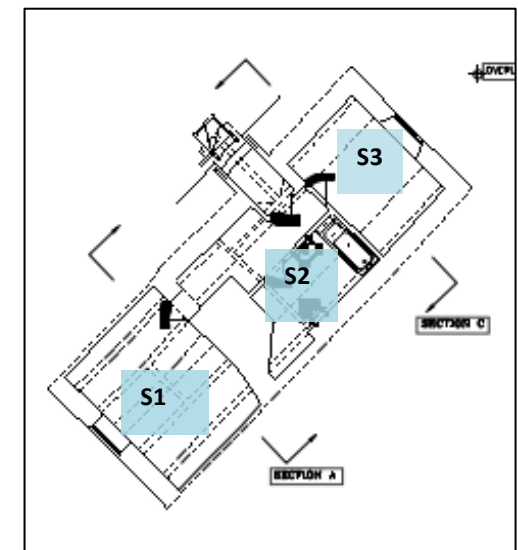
Second floor/attic plan with room codes, taken from survey drawings provided by Advanced Surveys.
